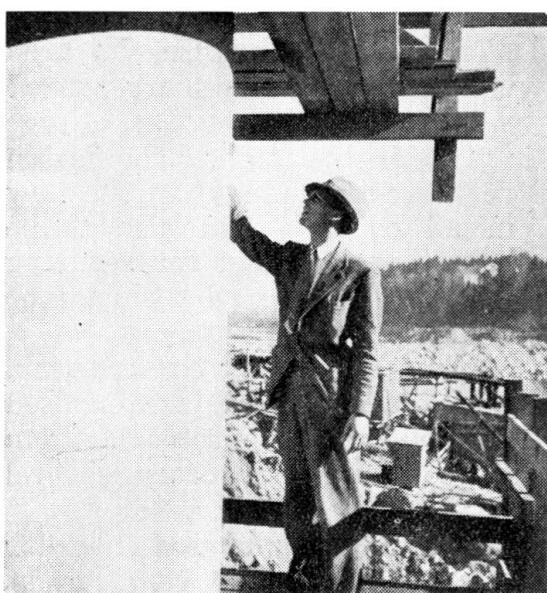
Examination of the concrete surface of a column at Bergeforsen
